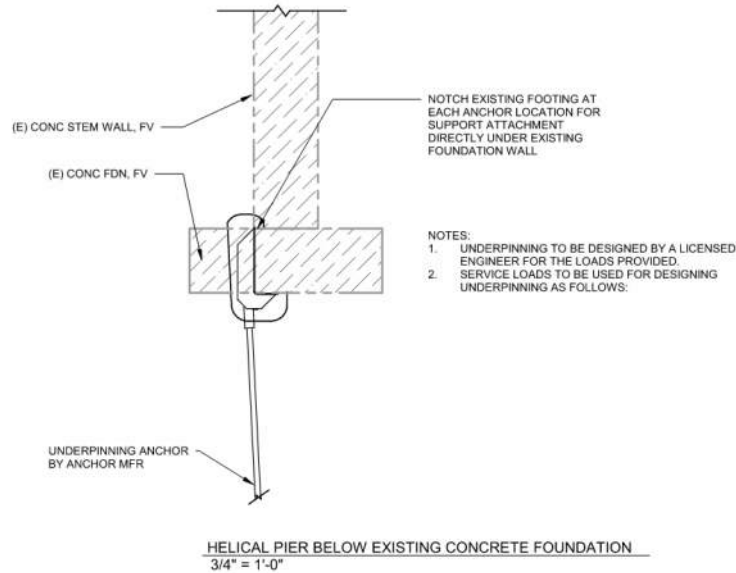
South Building Perimeter Wall Conceptual Foundation Stabilization Detail
